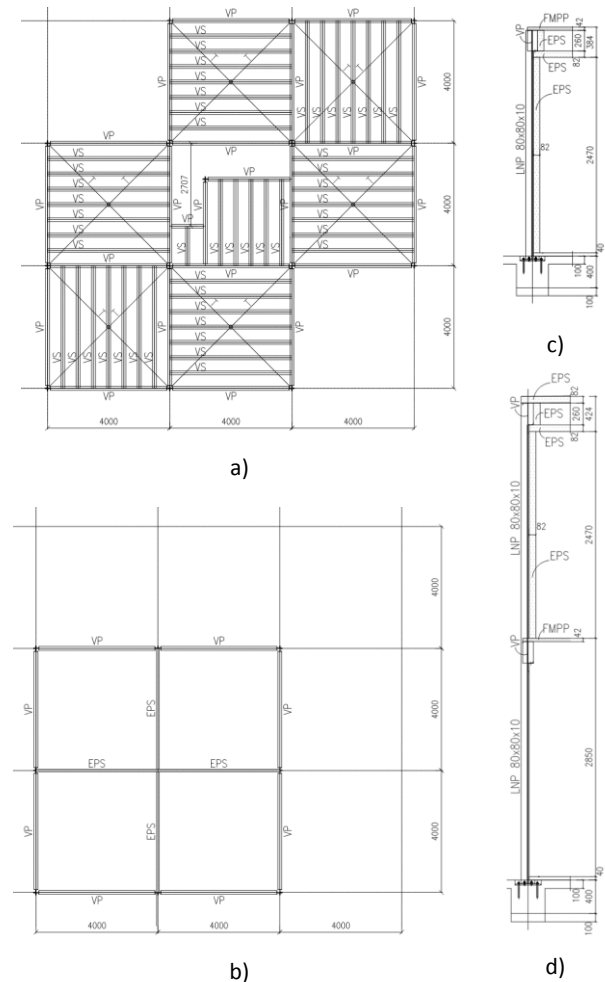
Casa Moçambique: a) Plant of elevated floor, b) roof plant, c) and d) two cutaway views
